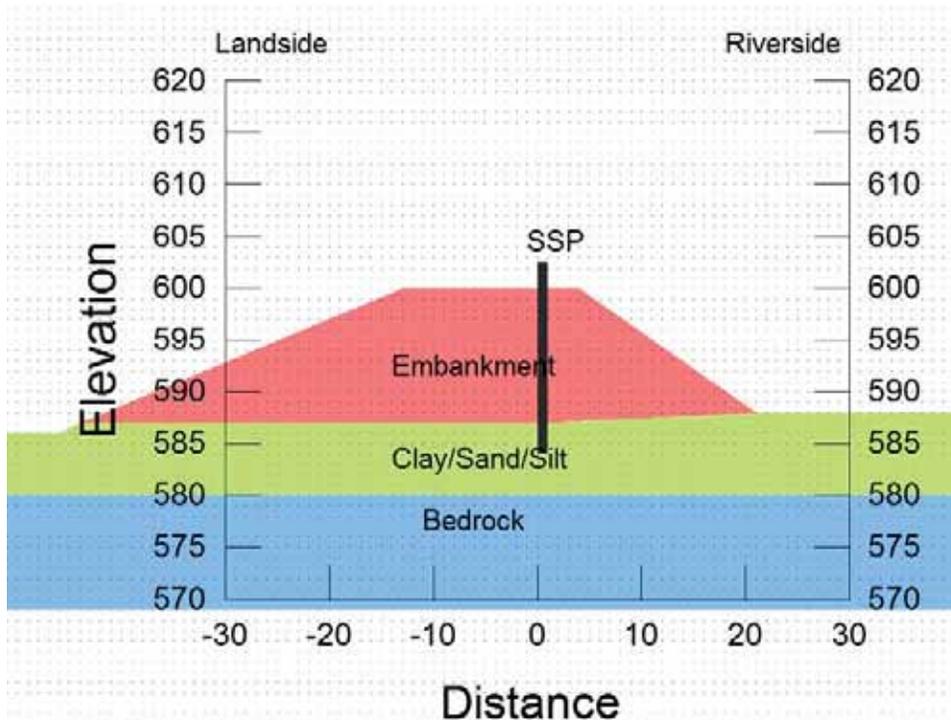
Typical McCook Levee Cross Section Showing Sheetpile not cutting off Seepage (Sta. 1+00 to 41+00)
